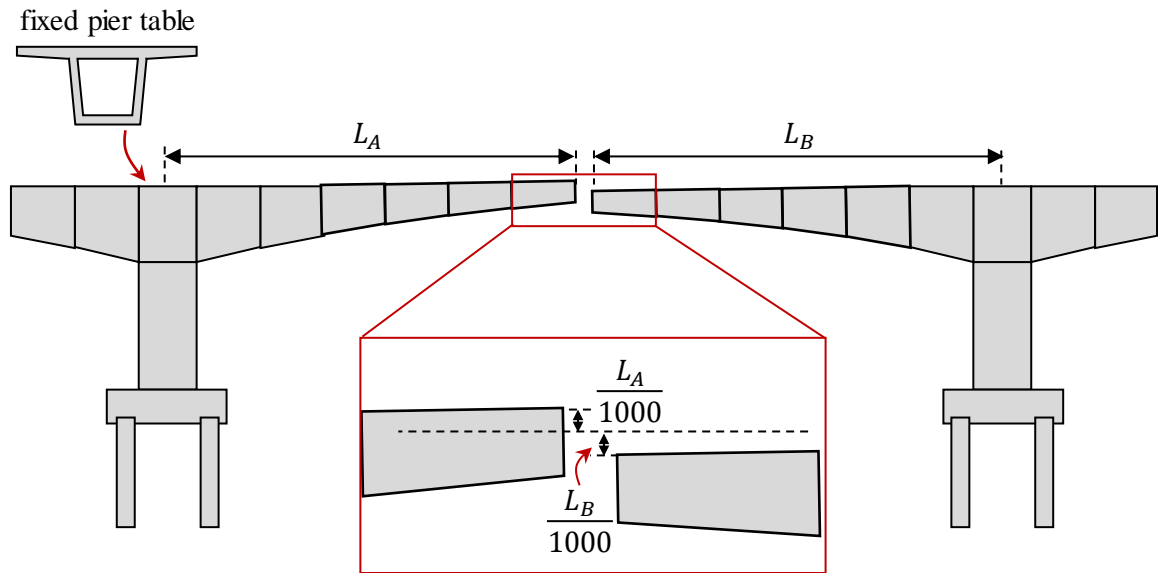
Post-tensioned segmental box girder bridge with fixed pier table
